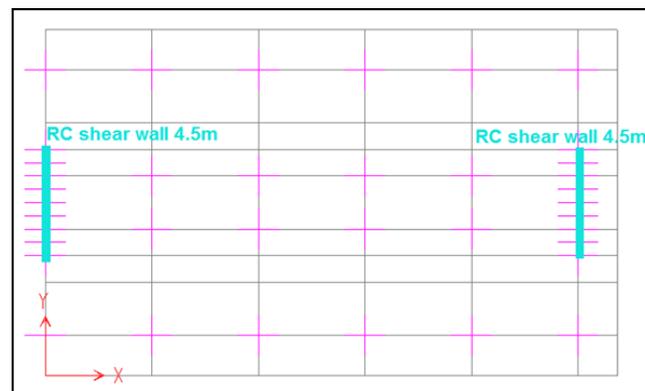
Second case—Modeling of shear wall of 4.5 m in length.
